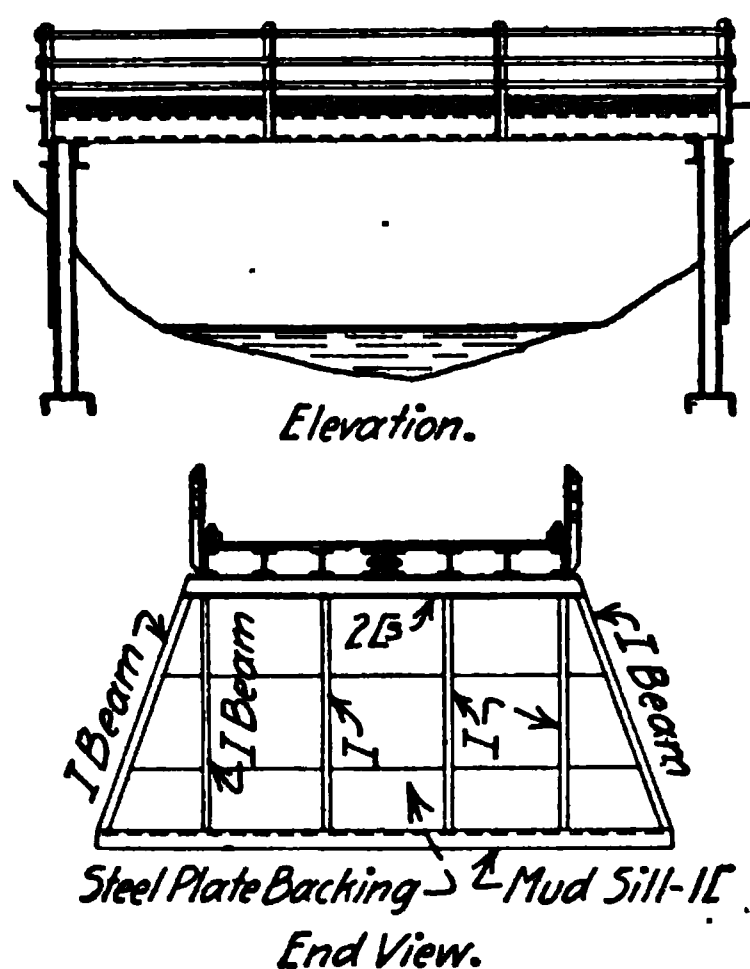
BEAM LEG BRIDGE WITH STEEL PLATE BACKING.
